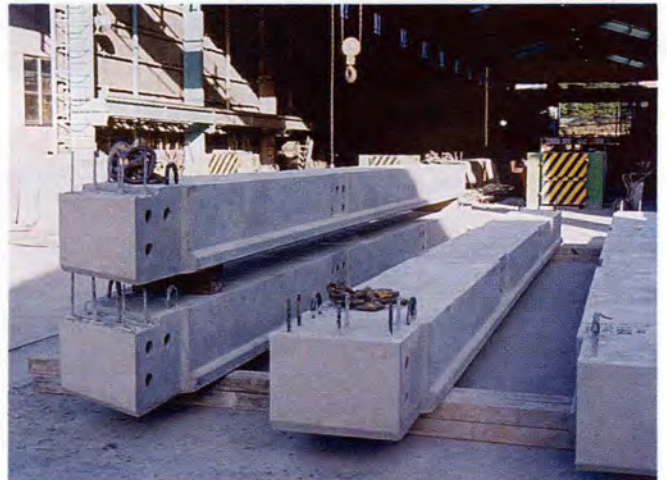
Completed box girders. Note: Large depth of shear key, size and location of transverse post-tensioning.
